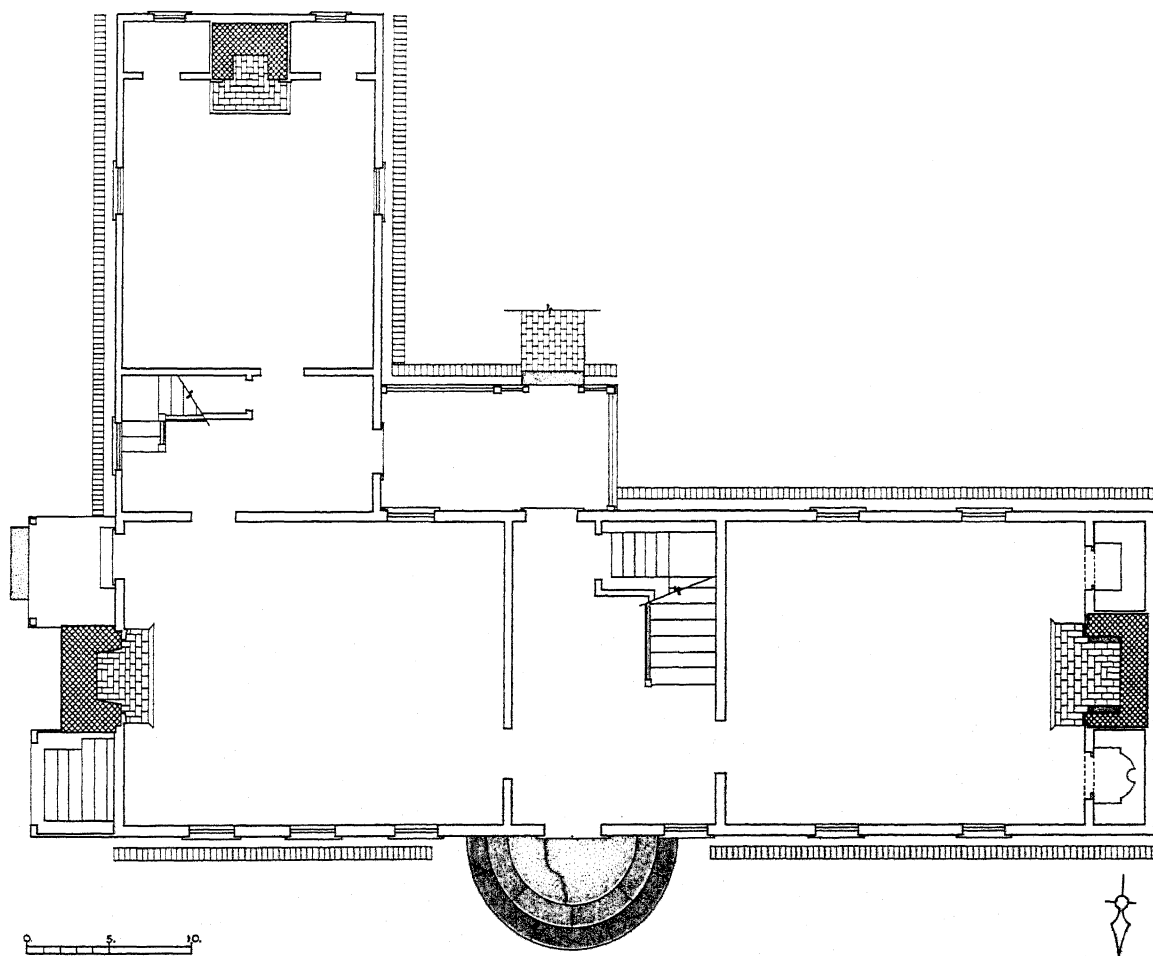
THE BENJAMIN WALLER HOUSE. Plan.
